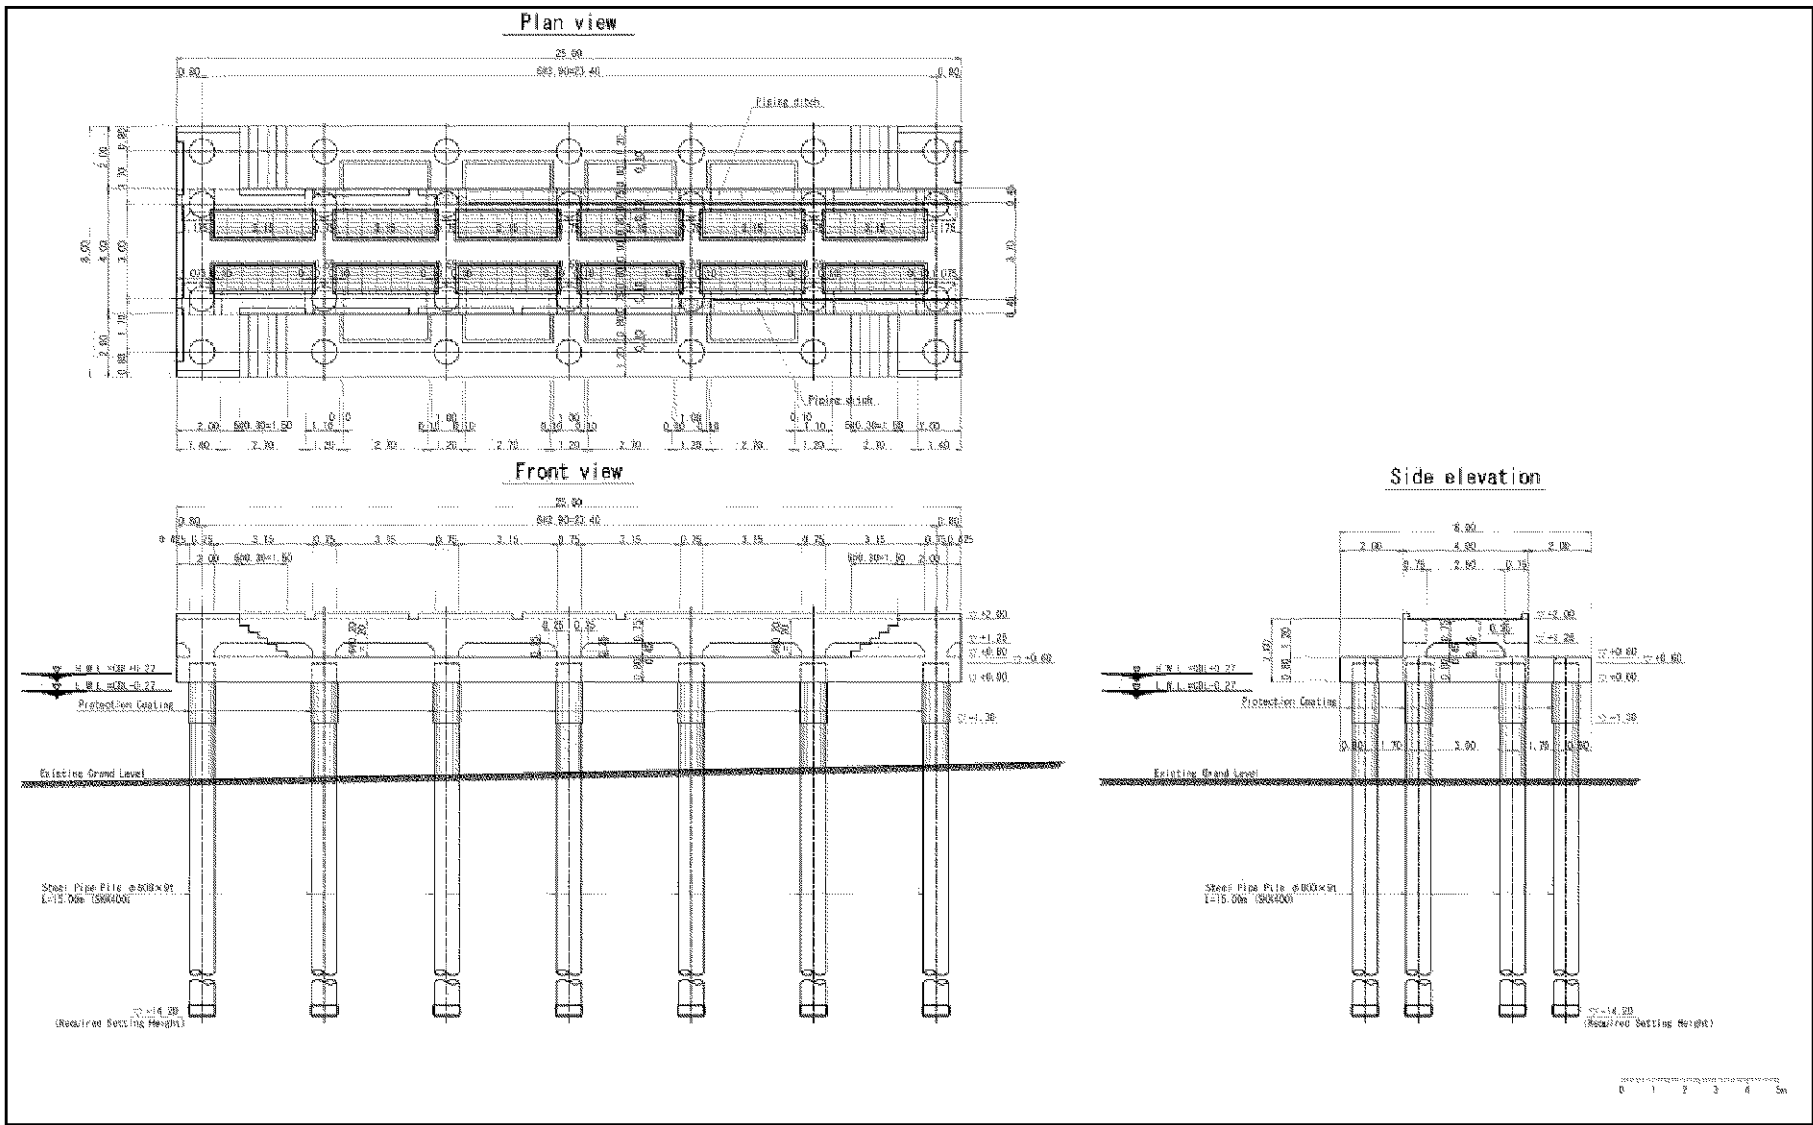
(3) Fishery Jetty Berth Part (Plan, View and Cross Section)
